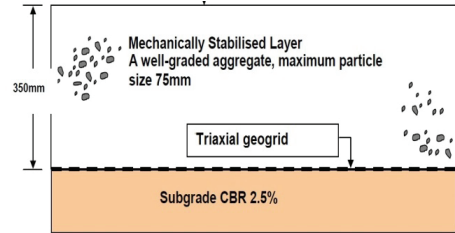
Section of the access roads, Chirnogeni Wind Farm
